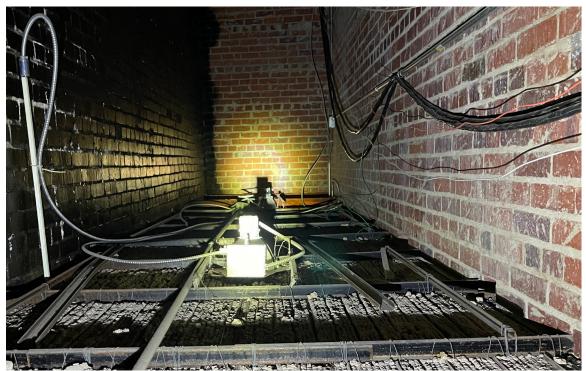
Weldon Auditorium: View above balcony stair ceiling. The exterior masonry wall is at left and has been waterproofed with a black coating. White efflorescence is visible within the mortar joints indicating active water intrusion through the masonry and black coating.
